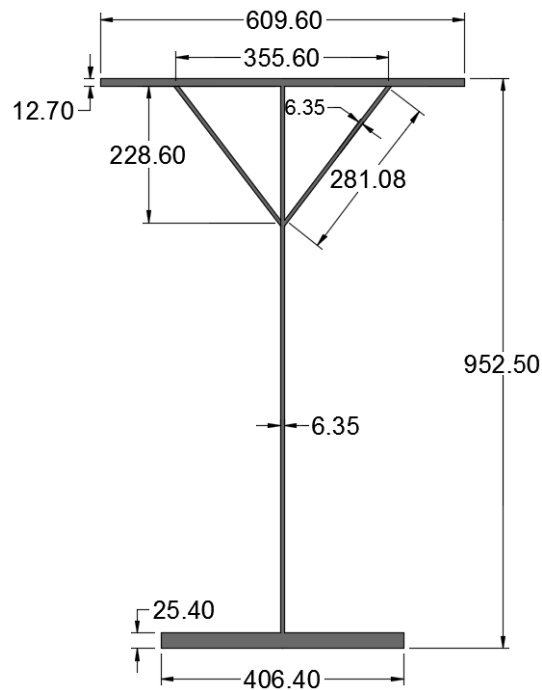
Cross-section dimensions in mm (Hadley, 1961)
